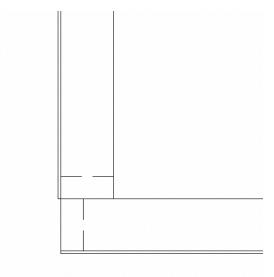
Zoomed in drafting detail of DSR corner of SR platform stud walls
